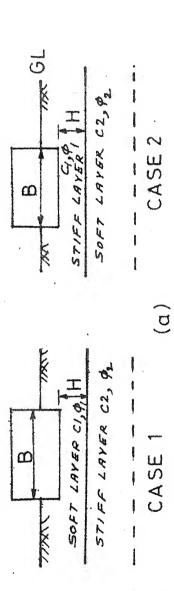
DIAG. SHOWING THE PLAN AND ELEVATION
